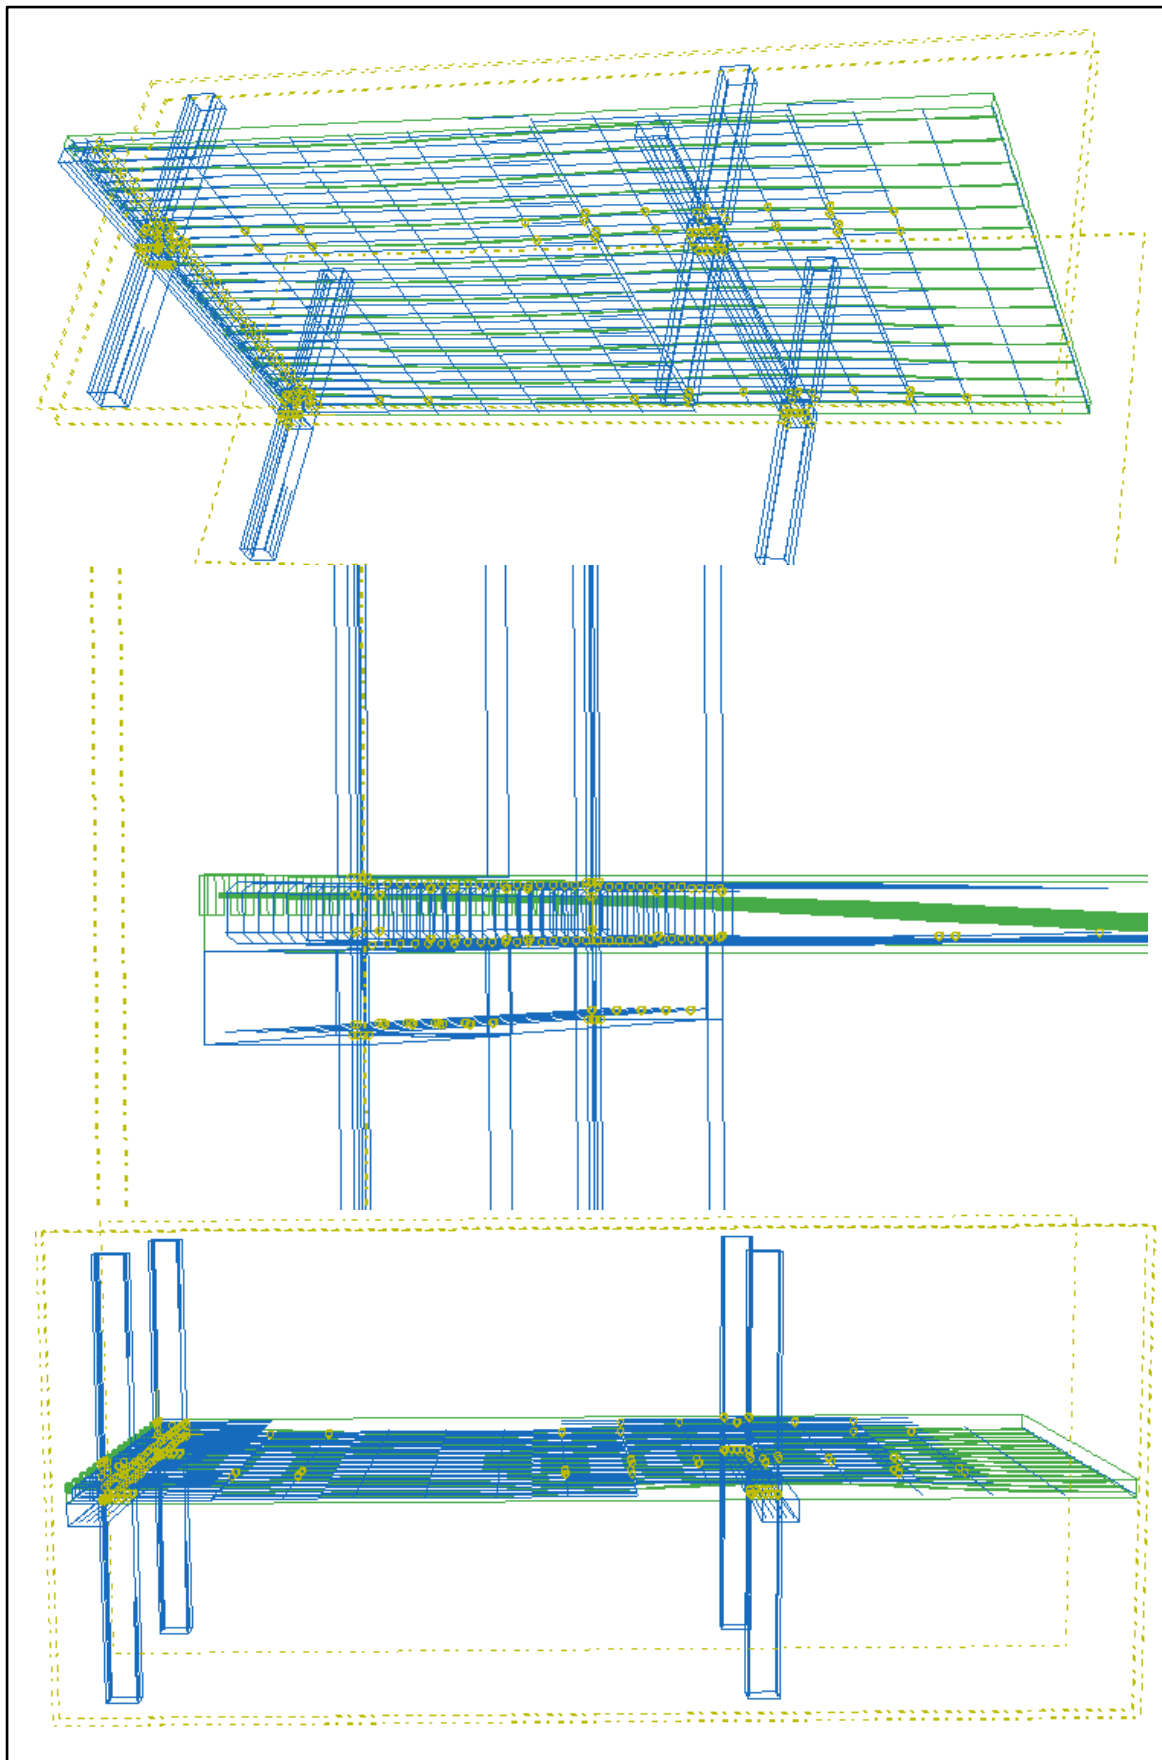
; Additional reinforcement schematics throughout the structure section (three structural views)
